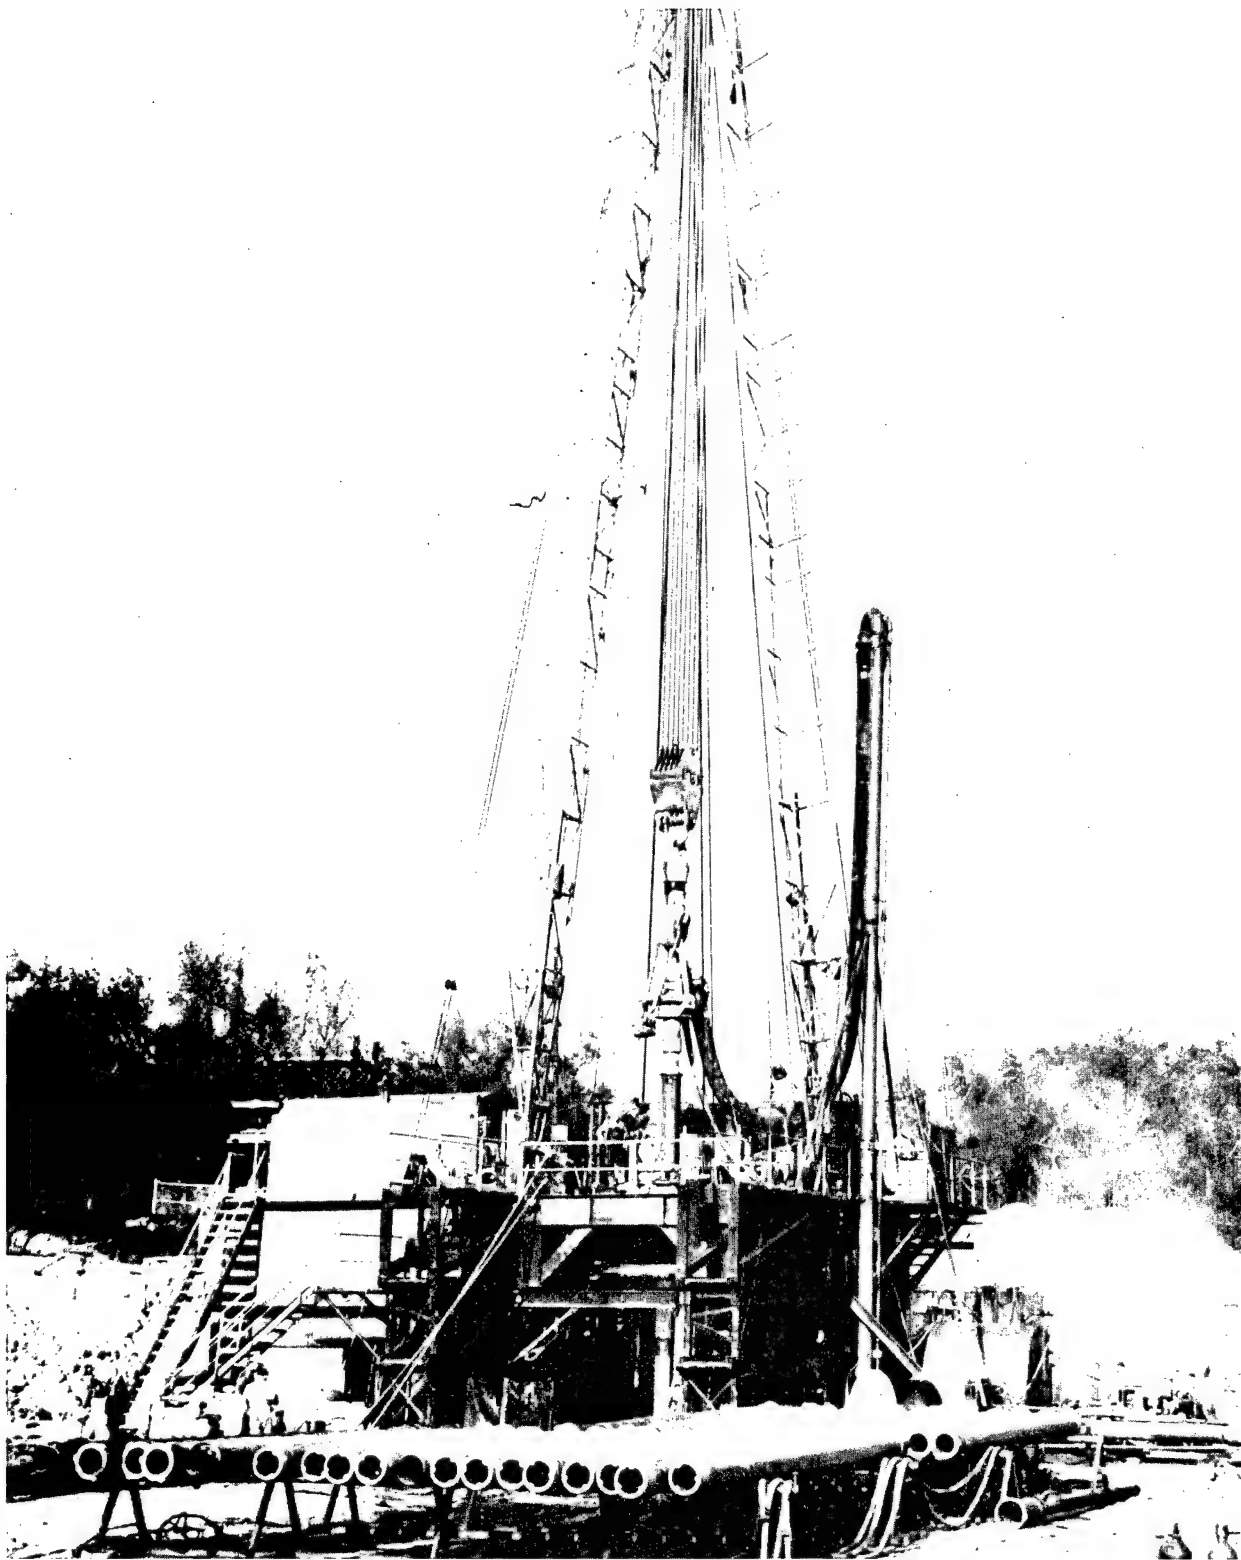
View of a drill rig over a 130" diameter hole. Note the bipod mast which is designed to boom forward to pick-up heavy drilling tools or casing. Photo-Drilling Magazine.
